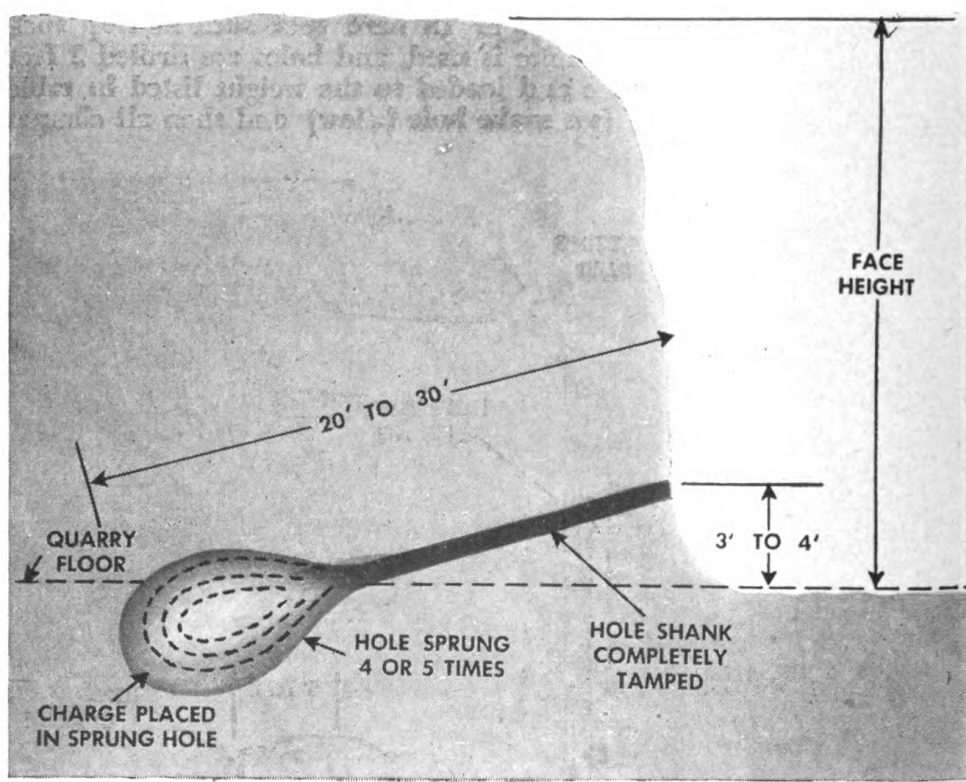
Snakeholing, showing steps in drilling, springing, and clearing.
